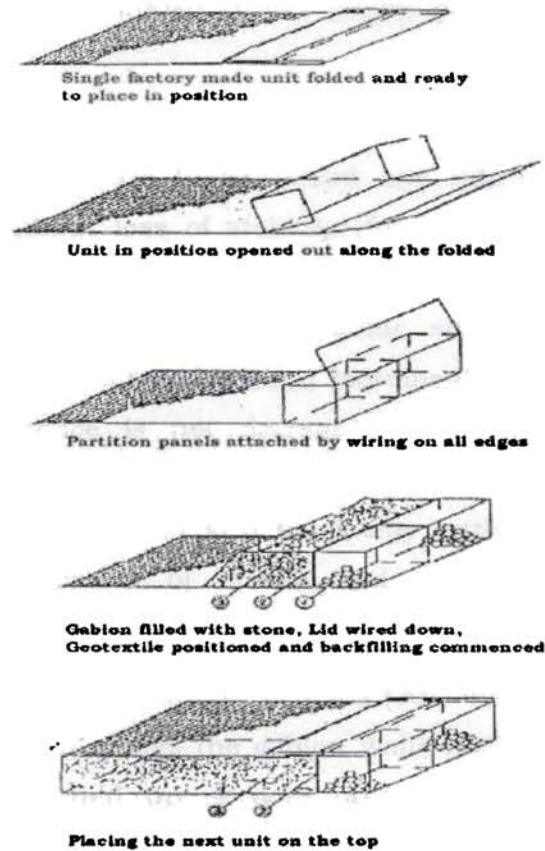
Gravity type gabion wall - construction procedure
